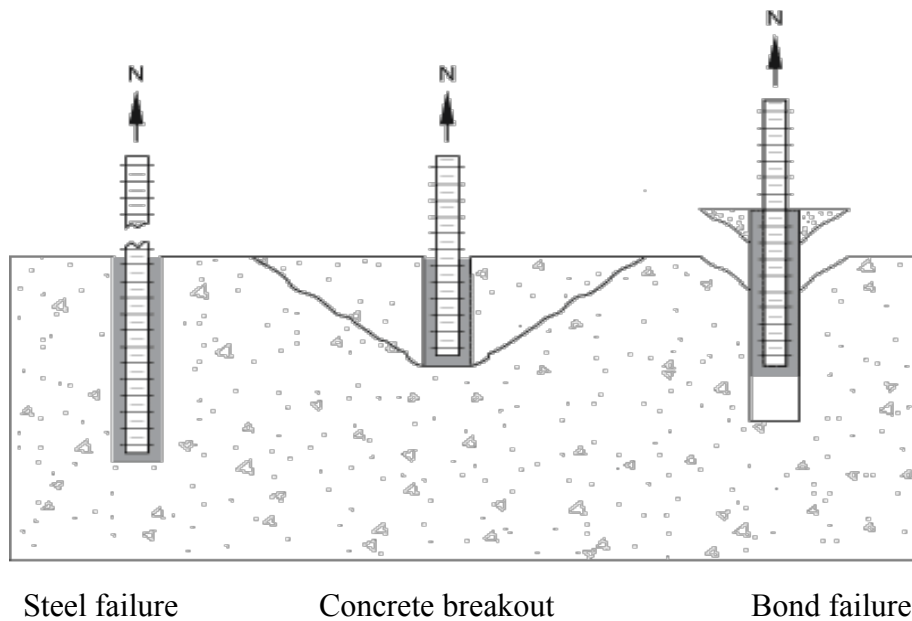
Possible failure modes (steel rebar)
